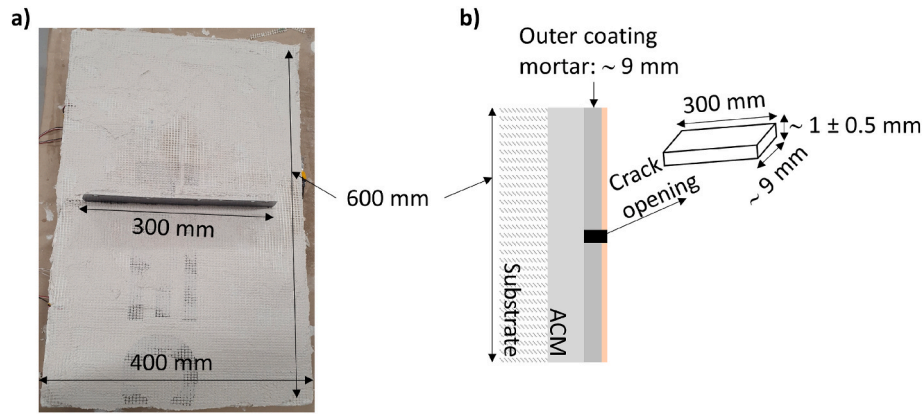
Creation of surface defects in Façades III-IV. A metal sheet was inserted through both layers of outer mortar (fresh mortars) to produce a vertical (Façade IV: Fig. 2c) or horizontal crack (Façade III). a) A sheet penetrating the first layer of outer mortar and mesh for a horizontal crack. b) Schematic on the dimension of the final crack opening at hardened stage (crack width: 1 ± 0.5 mm, crack depth: 9 mm, crack length: 300 mm).
